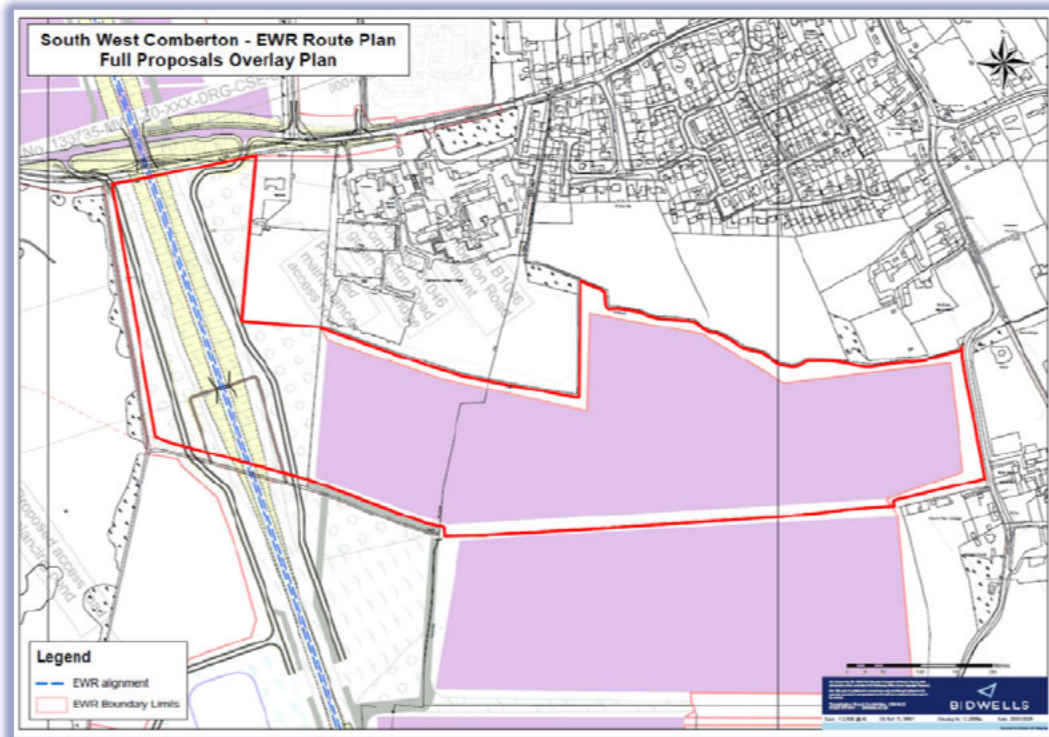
Overlay Plan showing Full EWR Construction Proposals and Client Site
